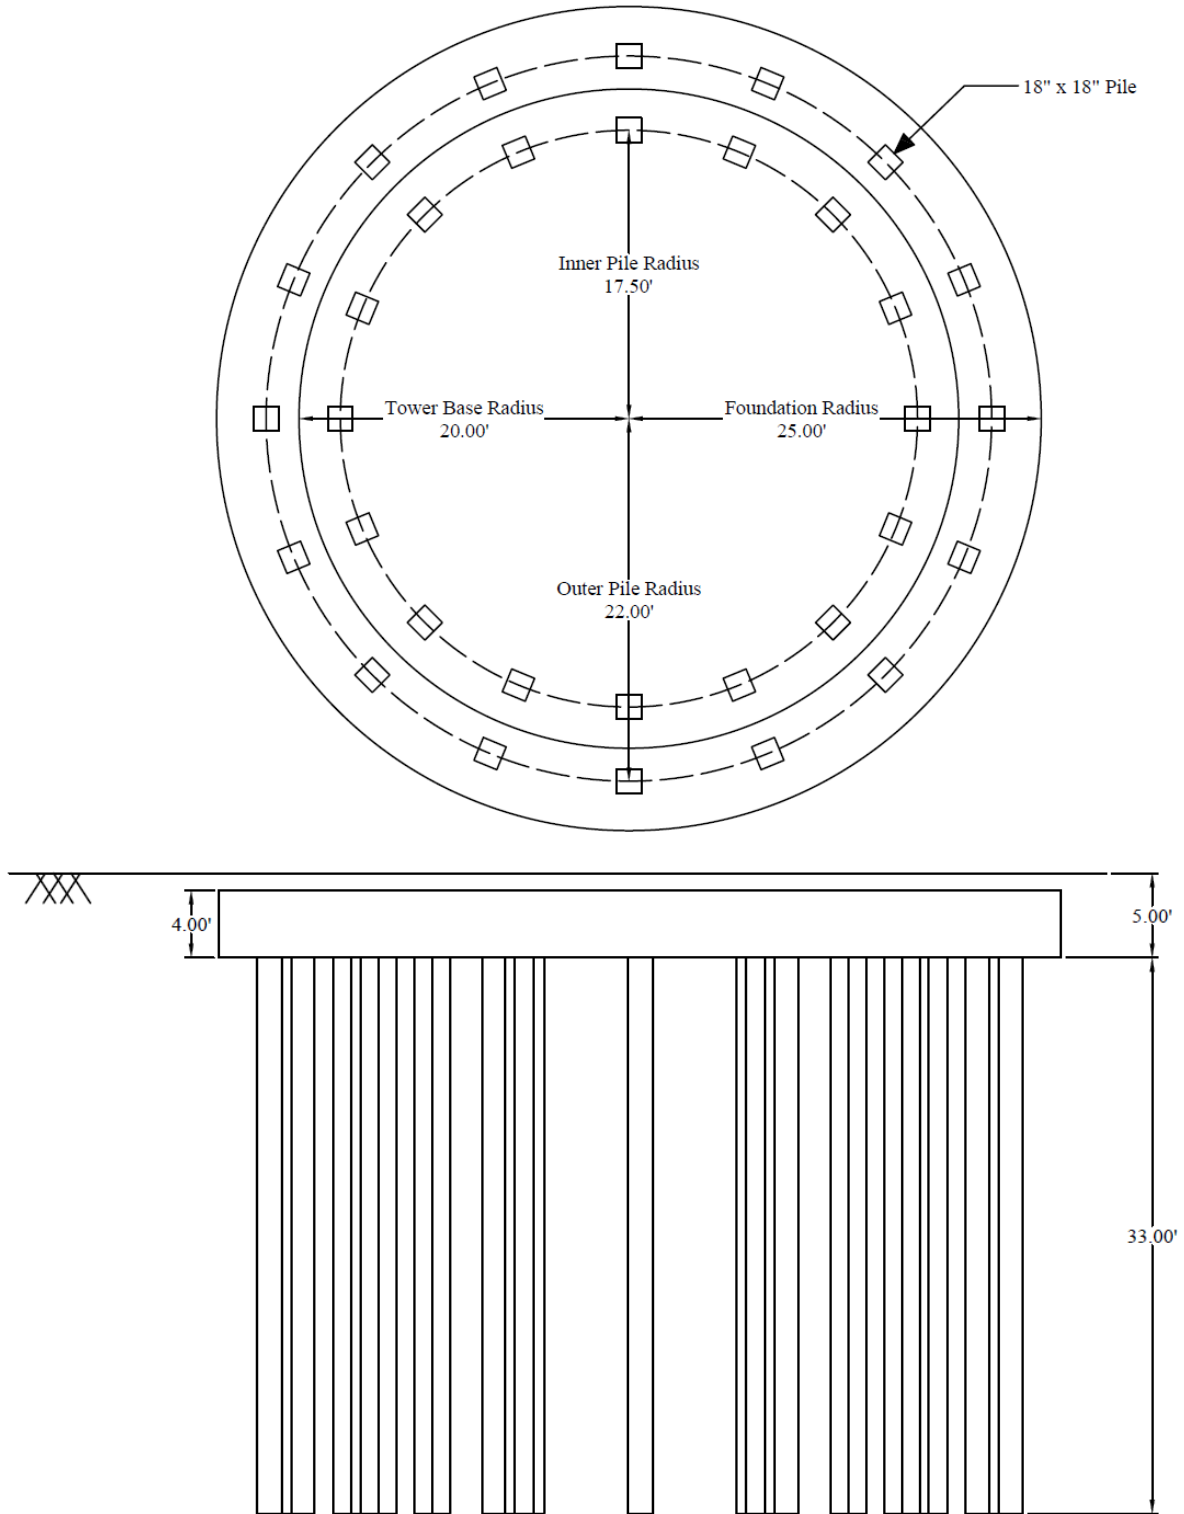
Wind Turbine Tower Pile Supported Foundation
